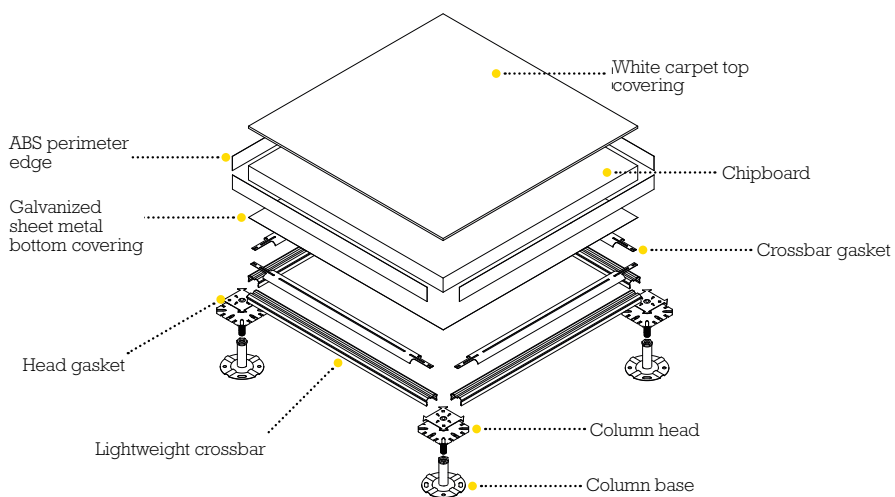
Constructive detail - Structure of the exhibition platform | Axonometric exploded view.
